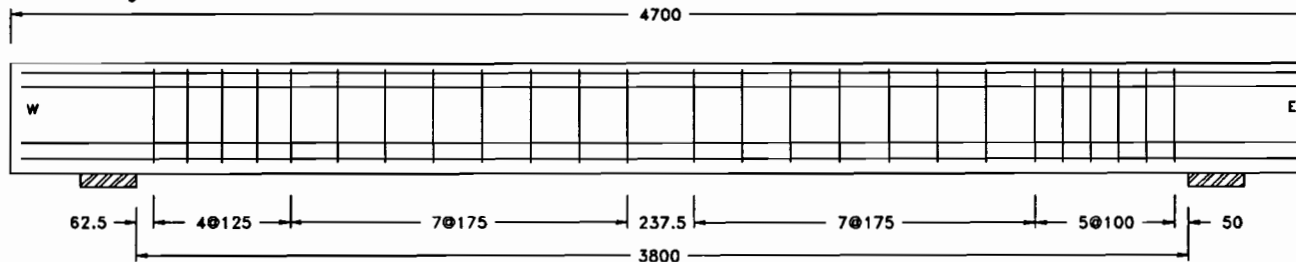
Reinforcement details of tee beam specimens TH500 and TM500
